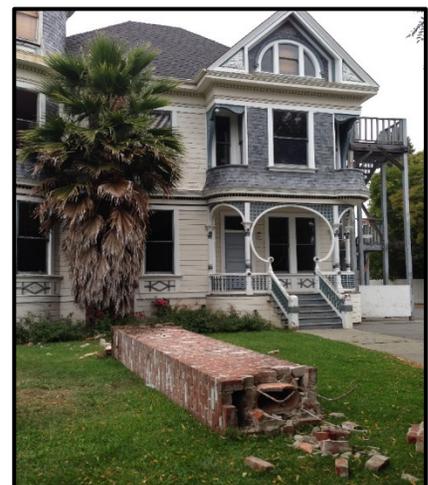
Chimney damaged in the South Napa Earthquake. Photo Credit: Janiele Maffei, CEA
